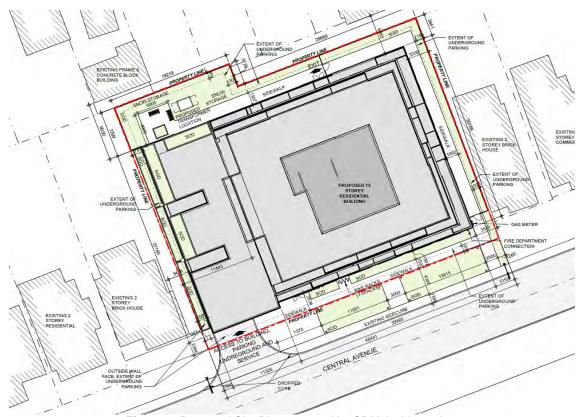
Proposed Site Plan prepared by SRM Architects Inc.
